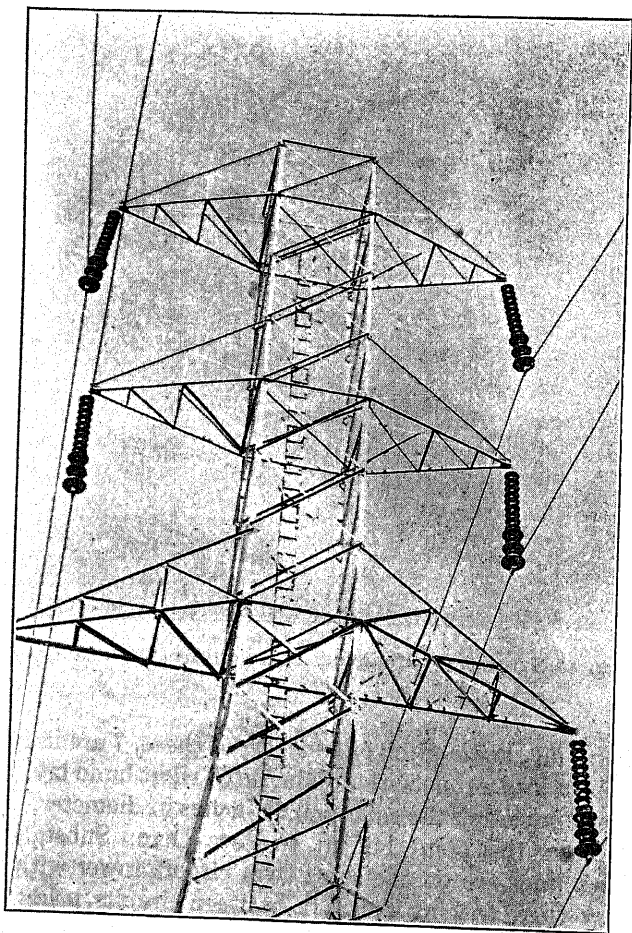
TOWER IN VERTICAL CONFIGURATION, COPPER SECTION
